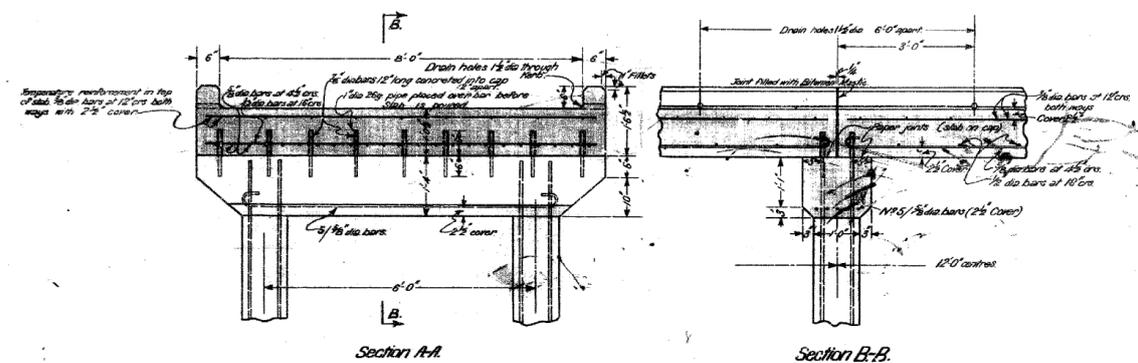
Cross-section and longitudinal-section at pier locations (original 1935 construction)
